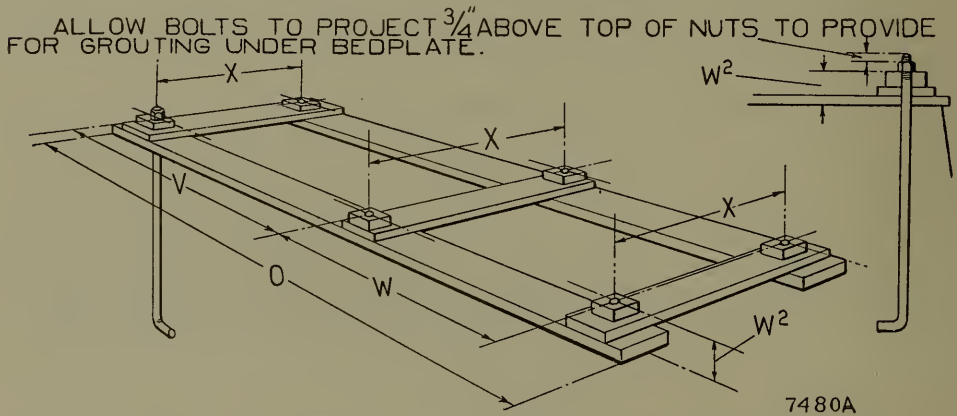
Skeleton sketch showing how a compressor foundation should be built.
